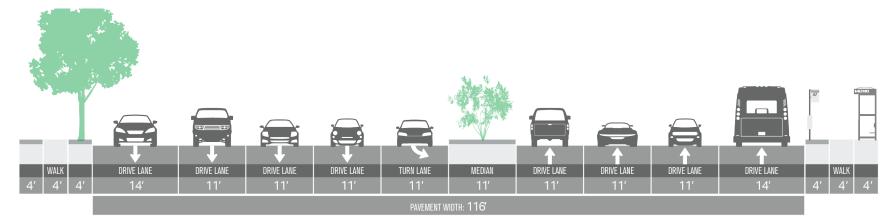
EXISTING CROSS SECTION OF HILLCROFT AVENUE AT DASHWOOD DRIVE
